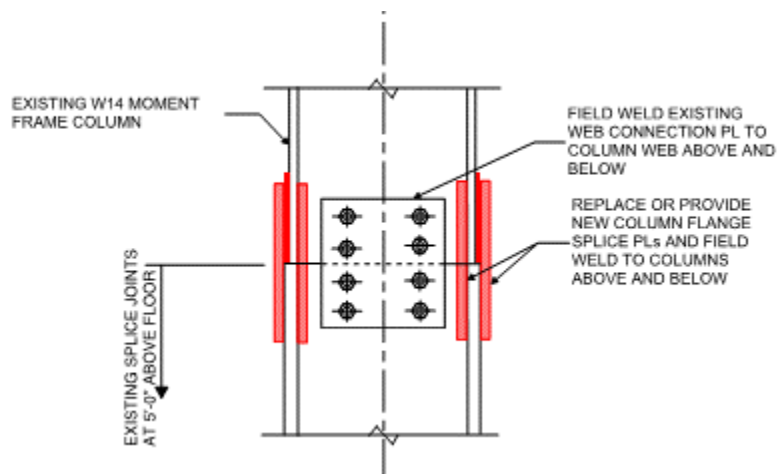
Moment Frame Column Splice Joint Reinforcement
